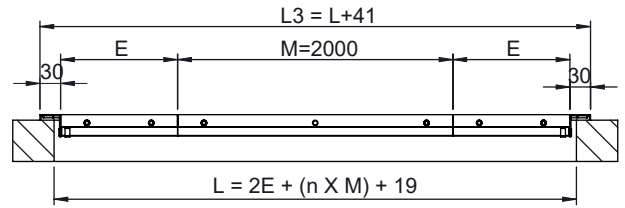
Typical Section of intermediate and end sections for a Type 'AH' Linear Grille.
